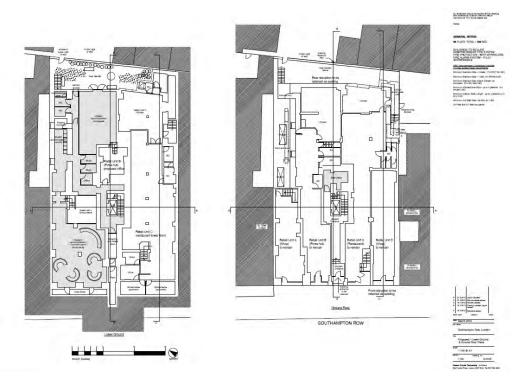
Proposed Development- Lower ground & Ground floor plans- Retail units. (Casson Conder Partnership 2012)
